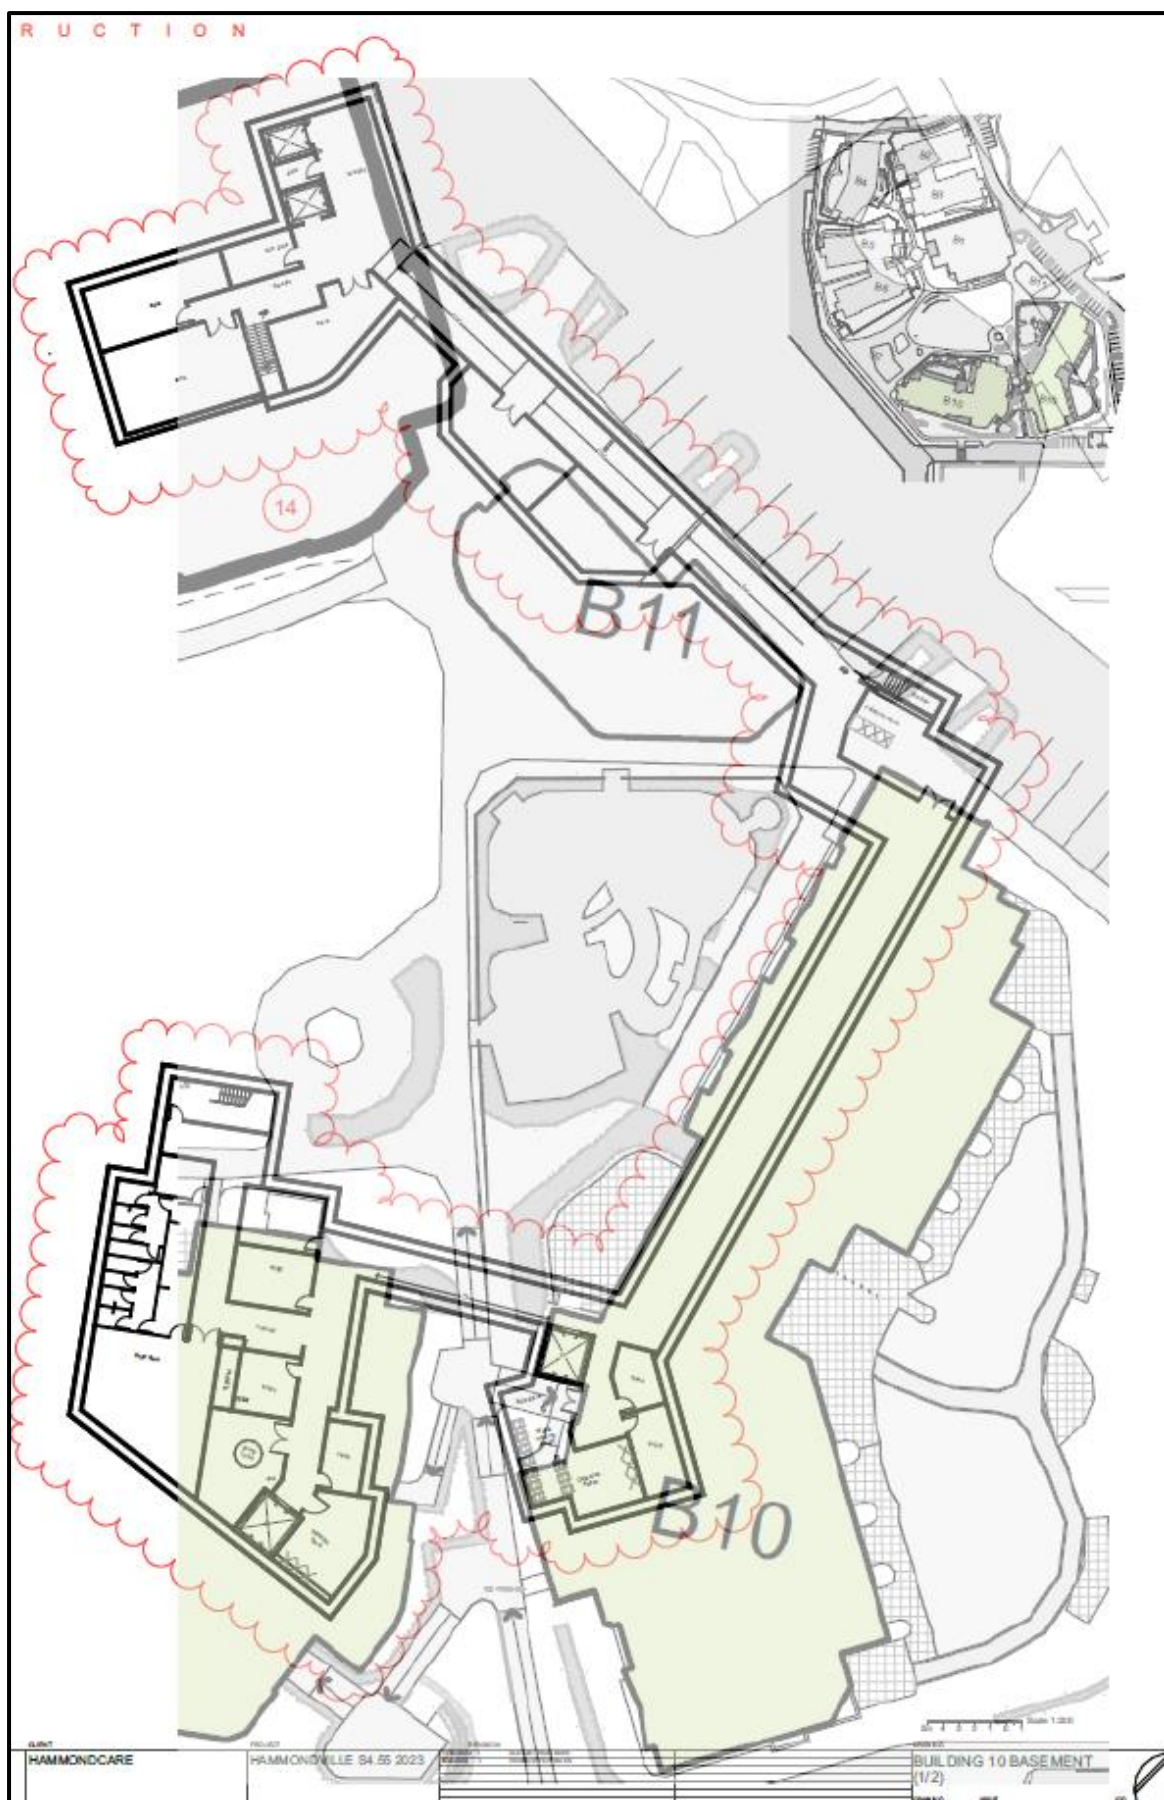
Rough overlay provided by applicant showing the basement connection between Buildings B10A/B and B1
